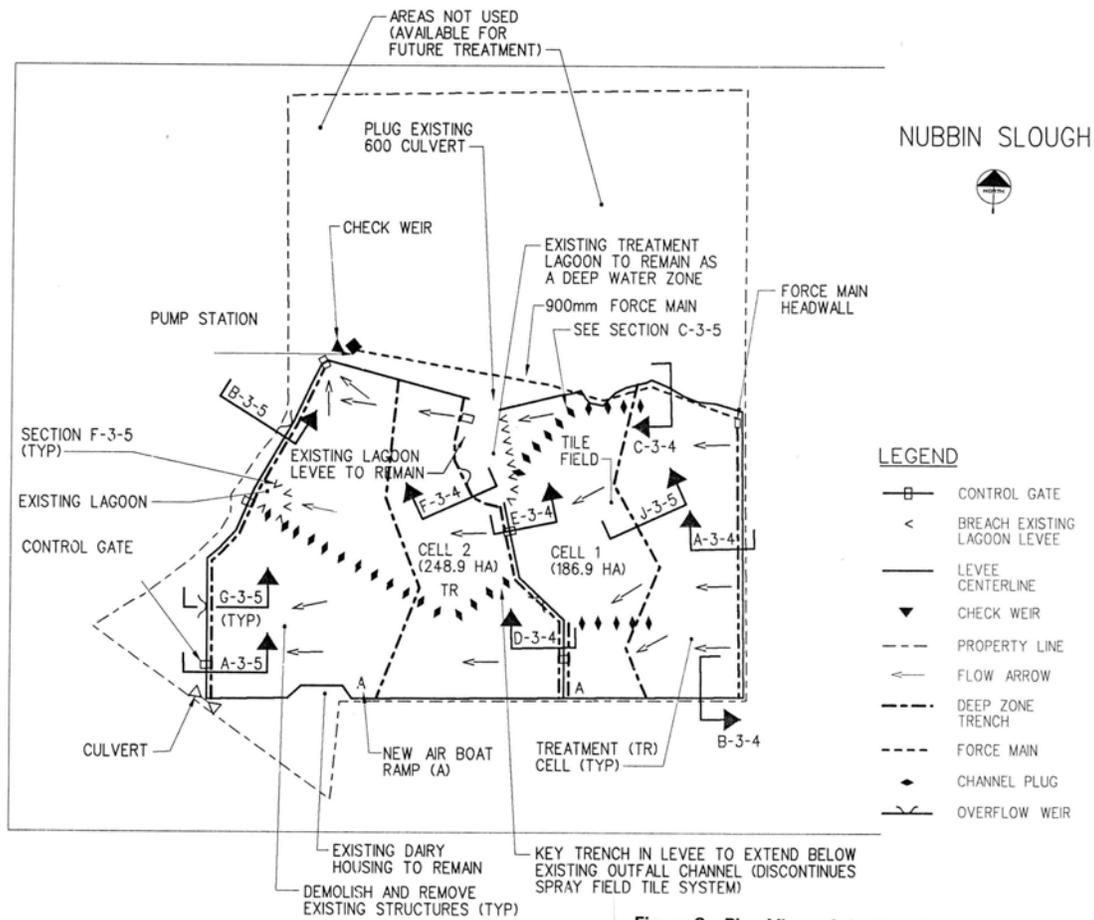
Plan View of the New Palm/Nubbin Slough Site
